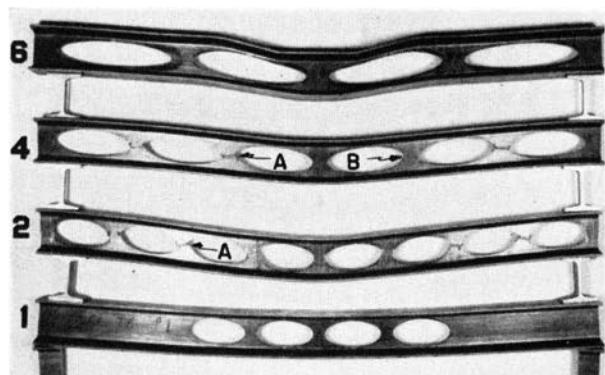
3-in. I-Beam Failures: No. 1 in Pure Bending, Others with Center Loading
